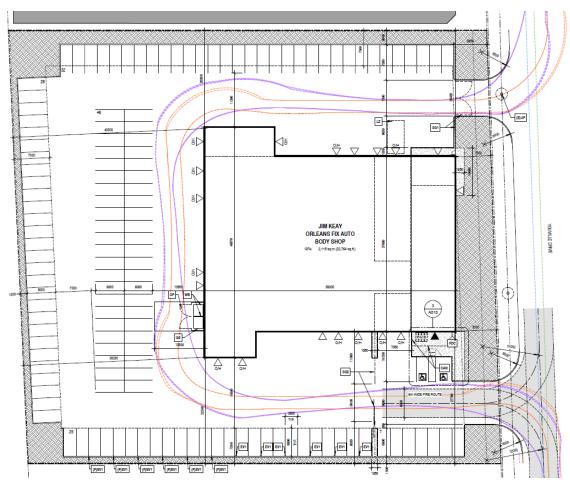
Excerpt of the site plan (KWC Architects Inc.)
